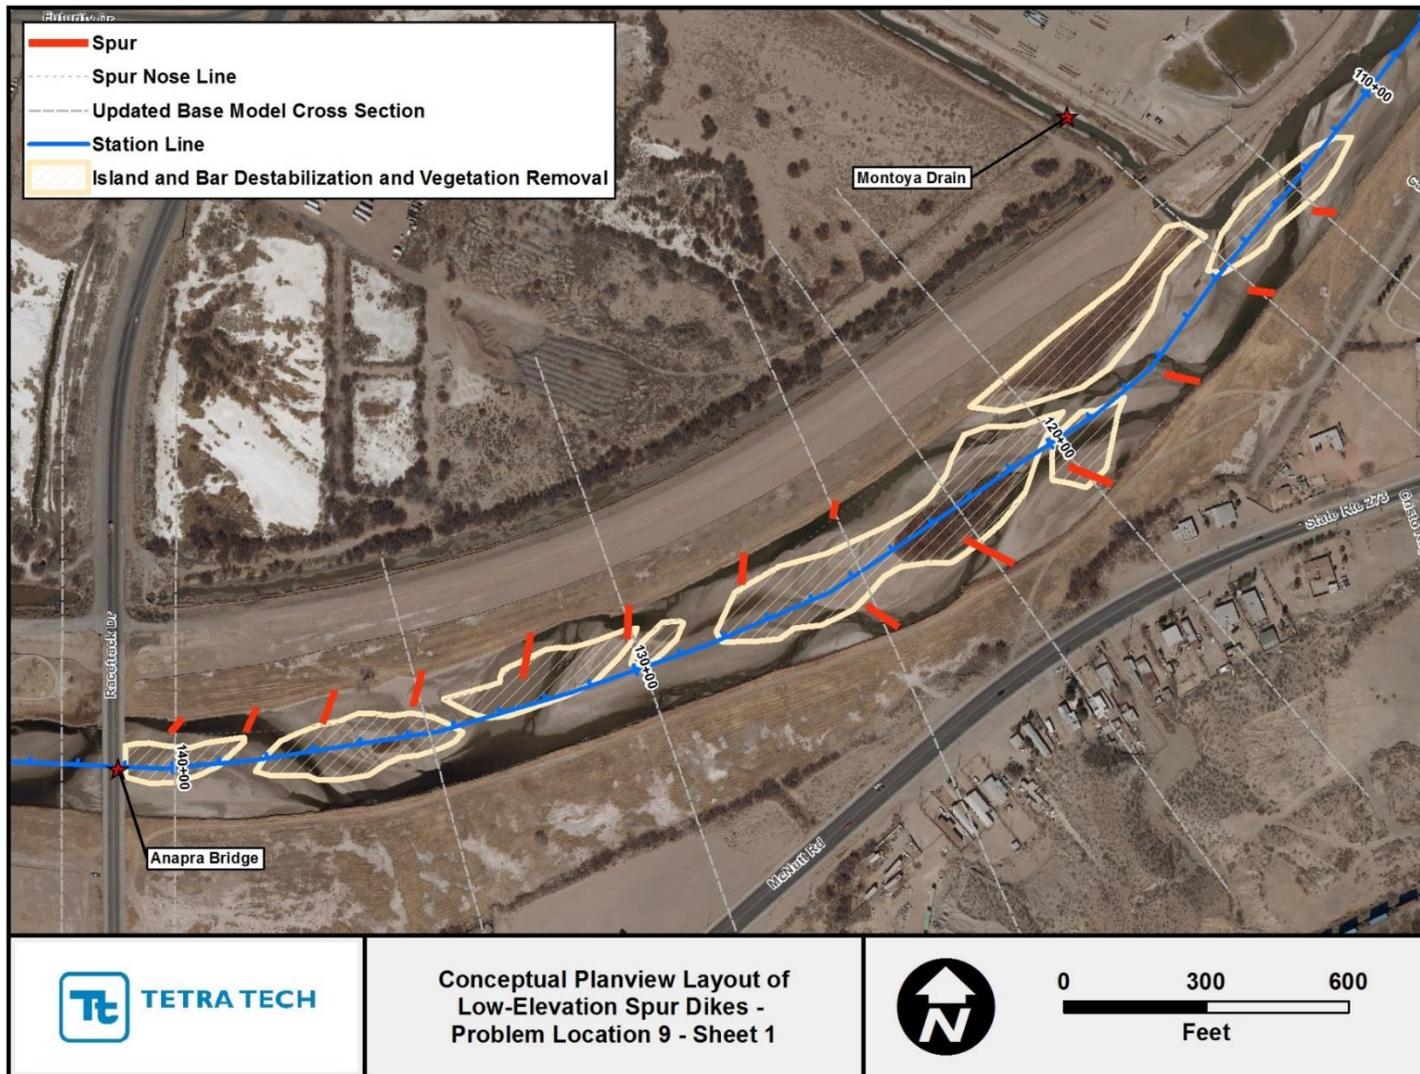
Conceptual layout of low-elevation spur dikes at Problem Location 9.
